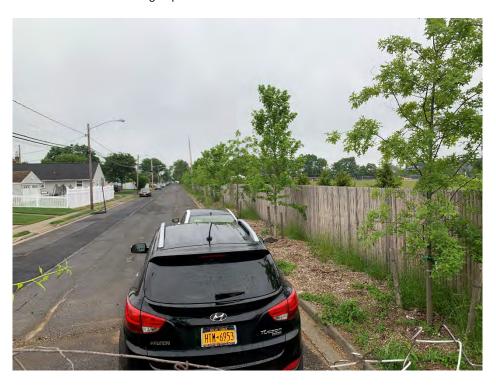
C – Northwest corner of Site 1 looking east-southeast within fenced in area of Site 1 at berm, tree plantings and hydroseeding
